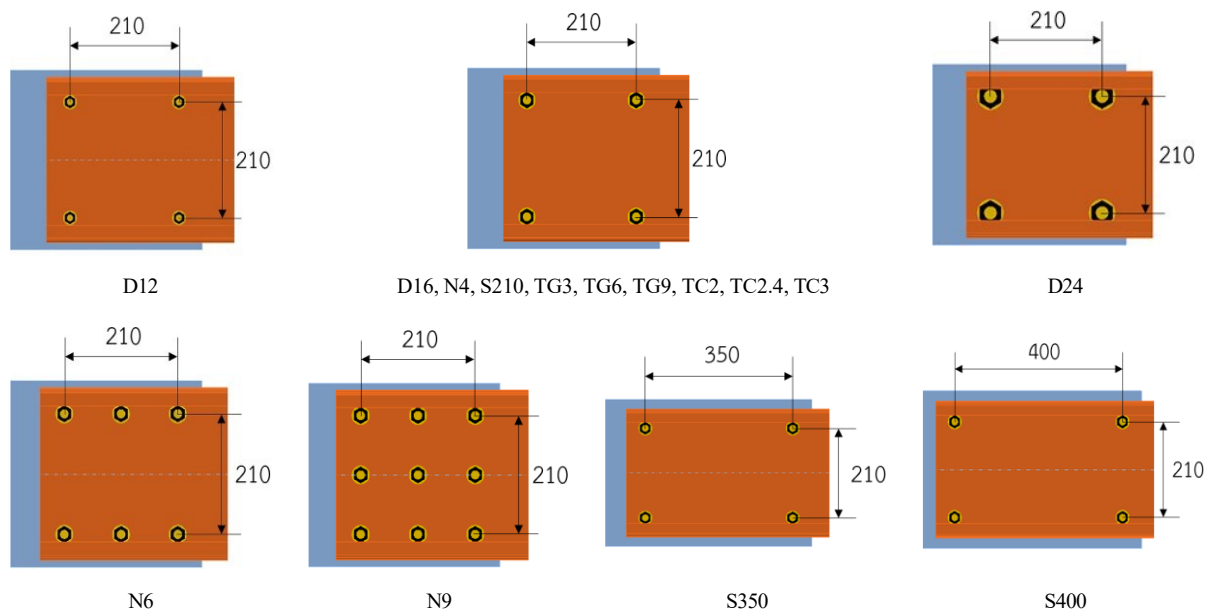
Geometrical details of one bolt group for the numerical samples-[Unit: mm]
